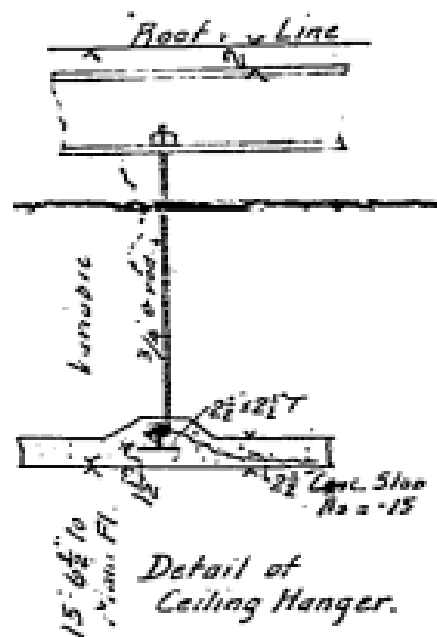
Detail of ceiling hanger from original architectural drawing 131b
